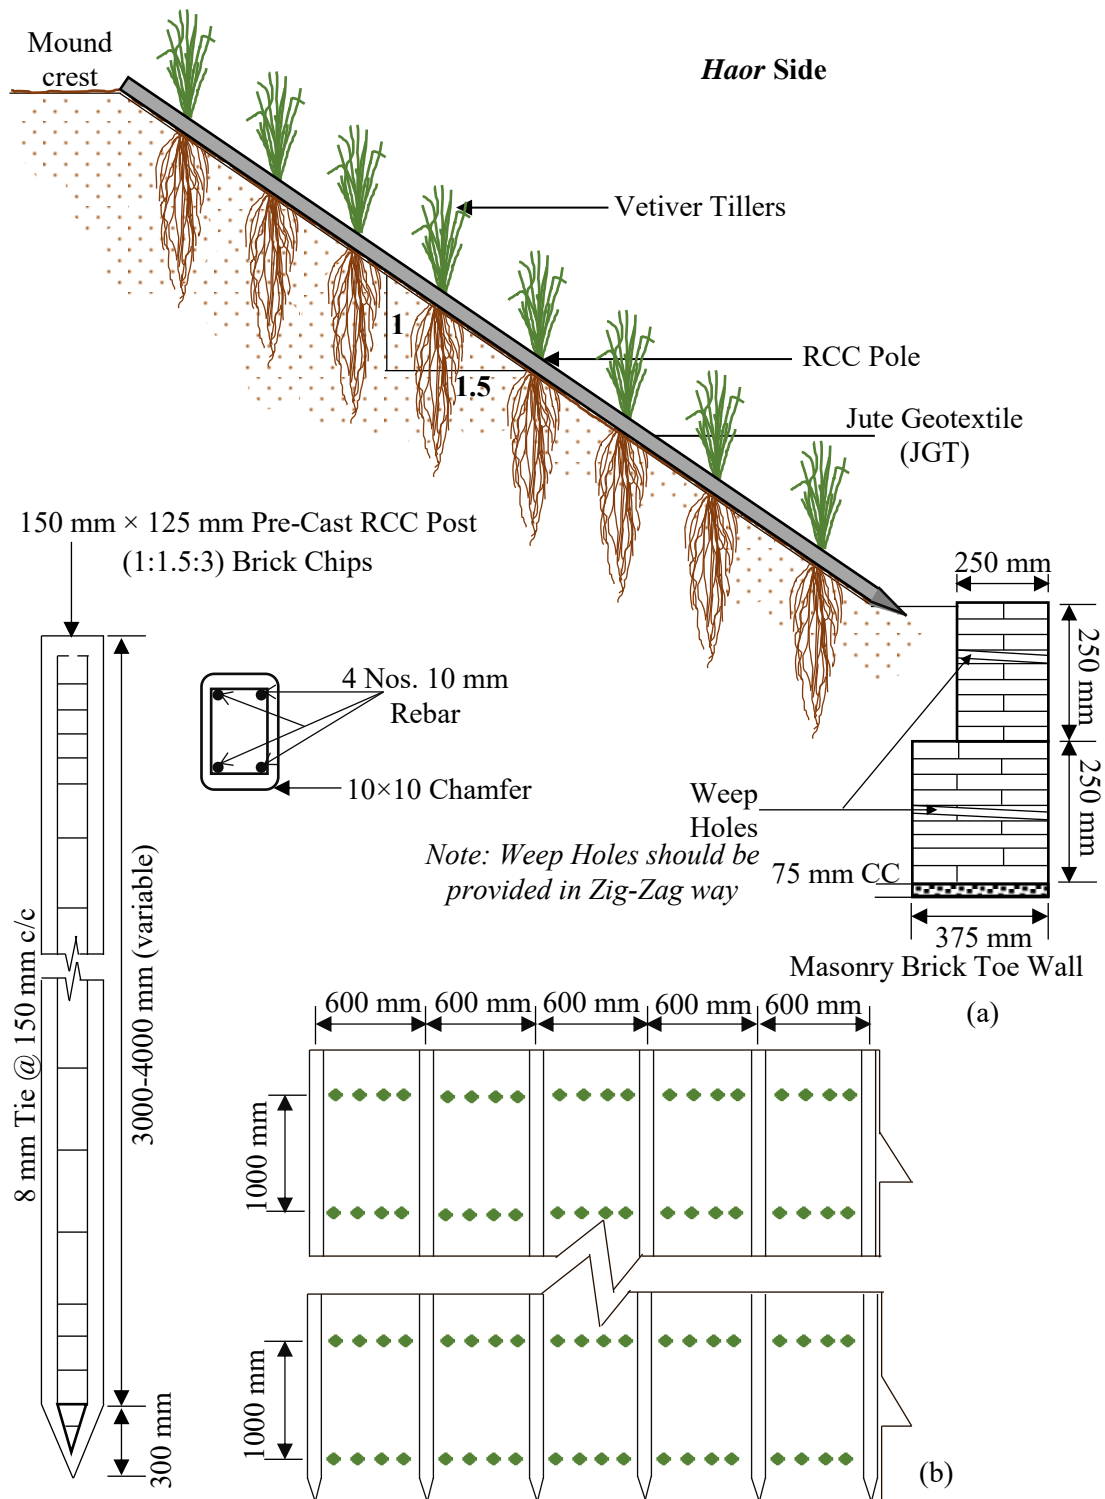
Schematic Drawing of Design Type IV, (a) Cross Sectional View; and (b) Plan View (Redrawn from Islam, 2019)
